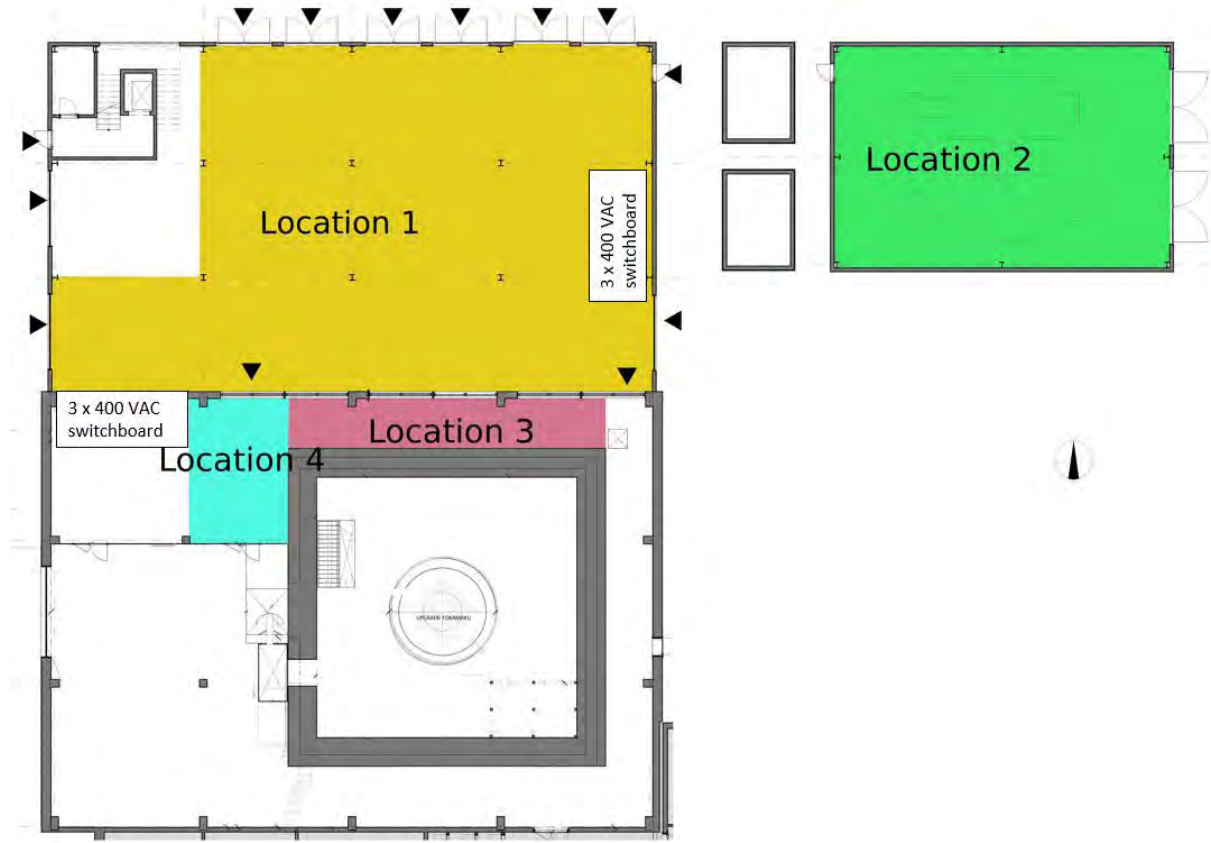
Plan of the ground floor at IPP (Client) site along with the planned additional building north of the assembly and tokamak hall and the new generator building. The assumed possible locations for placement of the Power Supply System components are highlighted.
